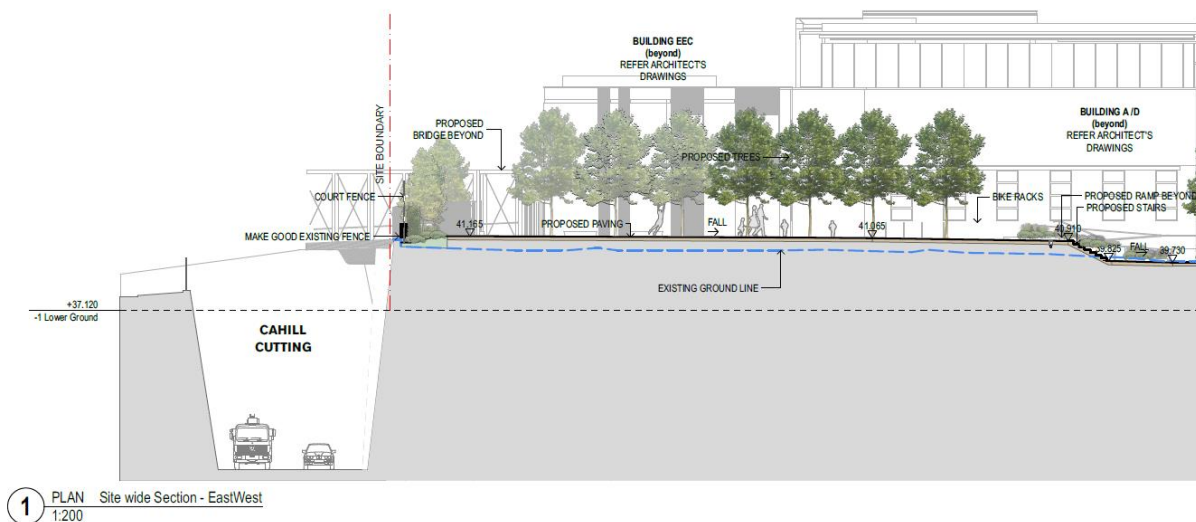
Landscaping Section (1)- EastWest (Source: FJMT DWG DA-8101, 18.10.19)
